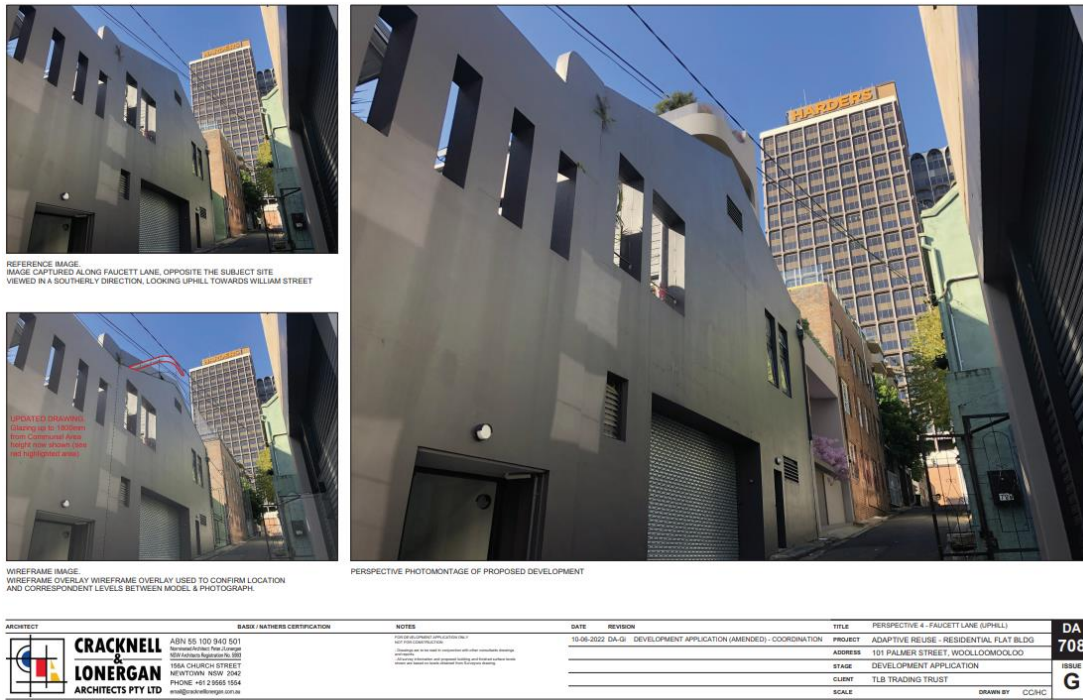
Proposed photomontage viewed from the western side of Faucett Ln, looking south-east (existing development shown adjacent)
